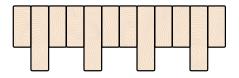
2:1 Alternating Staggered Depth Cross-Section.
